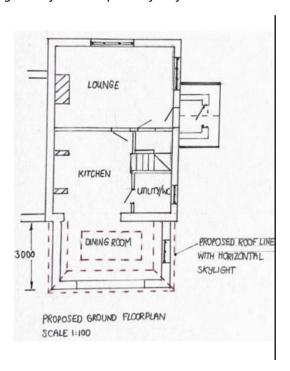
Plan showing the proposed pre-application extension with removed section of dining room wall – 2022 pre-app submission
